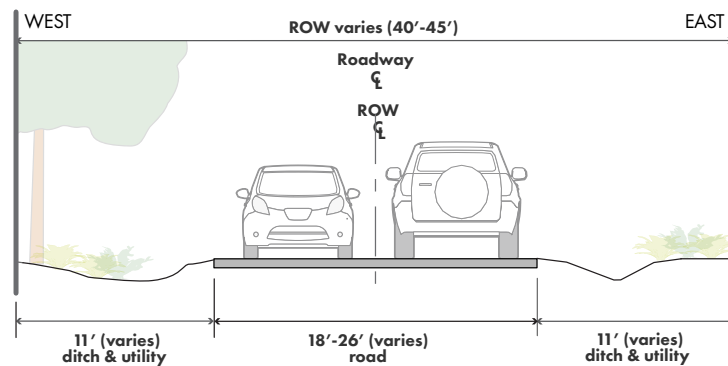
Recommendations for Roaring Springs Road (Wyncote Avenue to Beaverdam Park)
